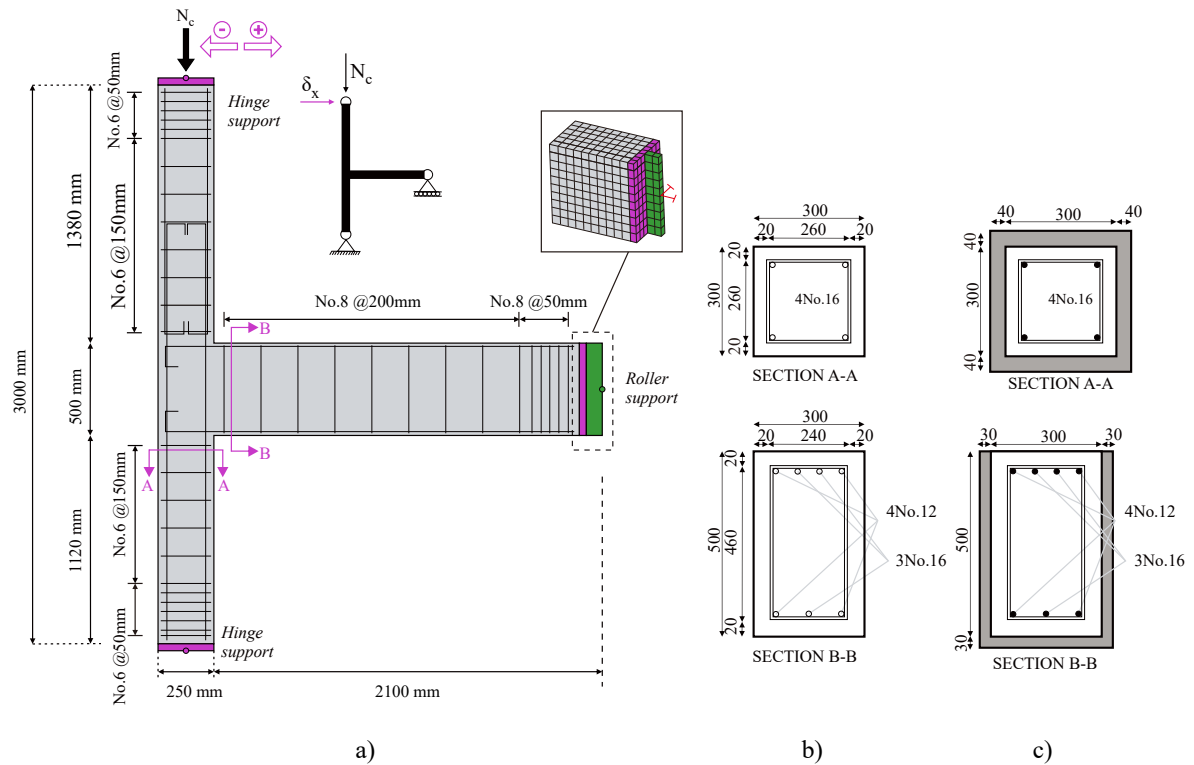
Geometrical details of: a) Beam-column joint, b) Sections of joint CJ2, and c) Sections of joint RCJ2.
